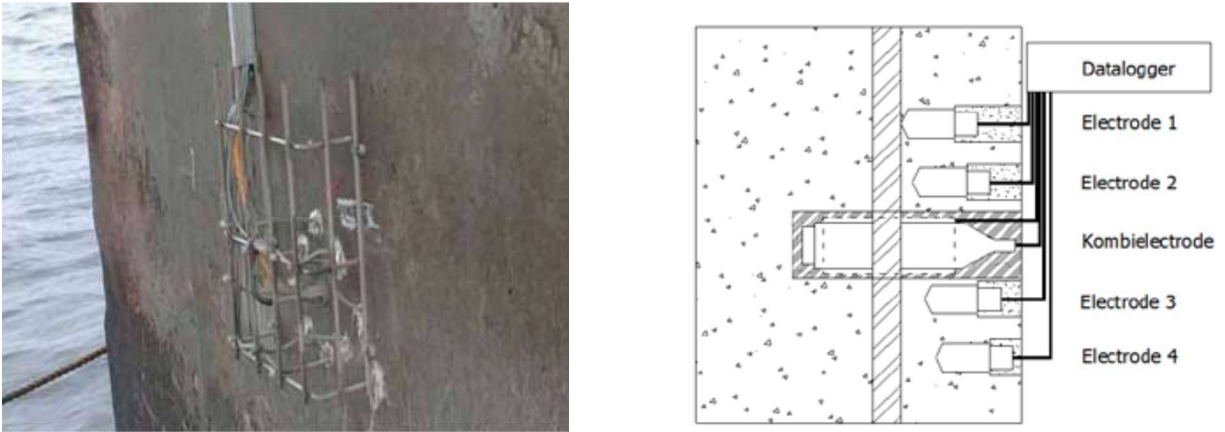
CorroRisk installation (left) and design (right) on a marine bridge pillar [75]
